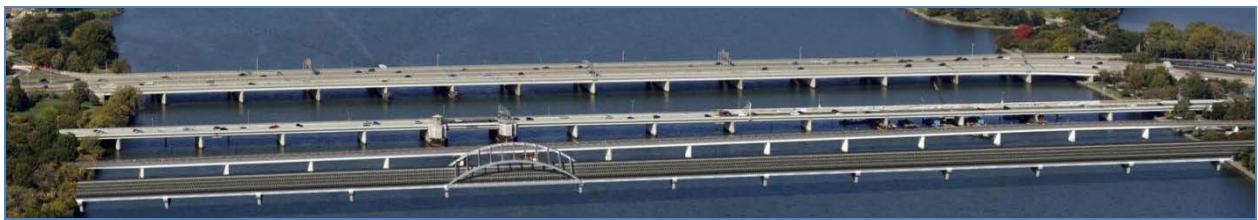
Steel Tied Arch Rendering of Long Bridge
